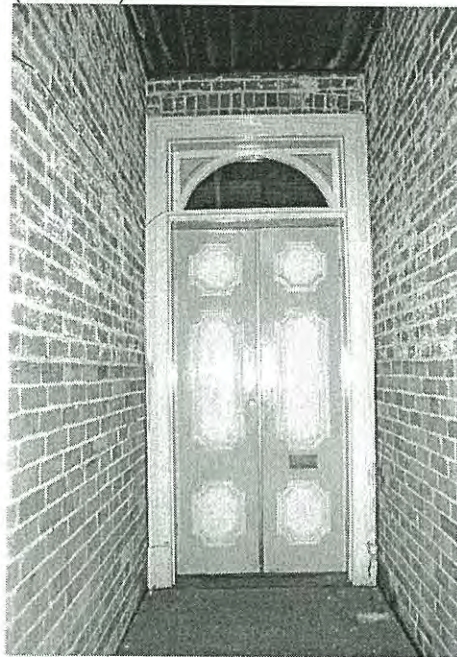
Interior, Exchange Hall (space H01). Detail of panellled double timber Call Room doors from the northern passage.
